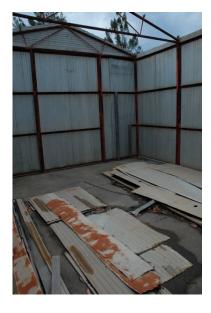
Interior of former Halfway Creek fire station, facing south.
